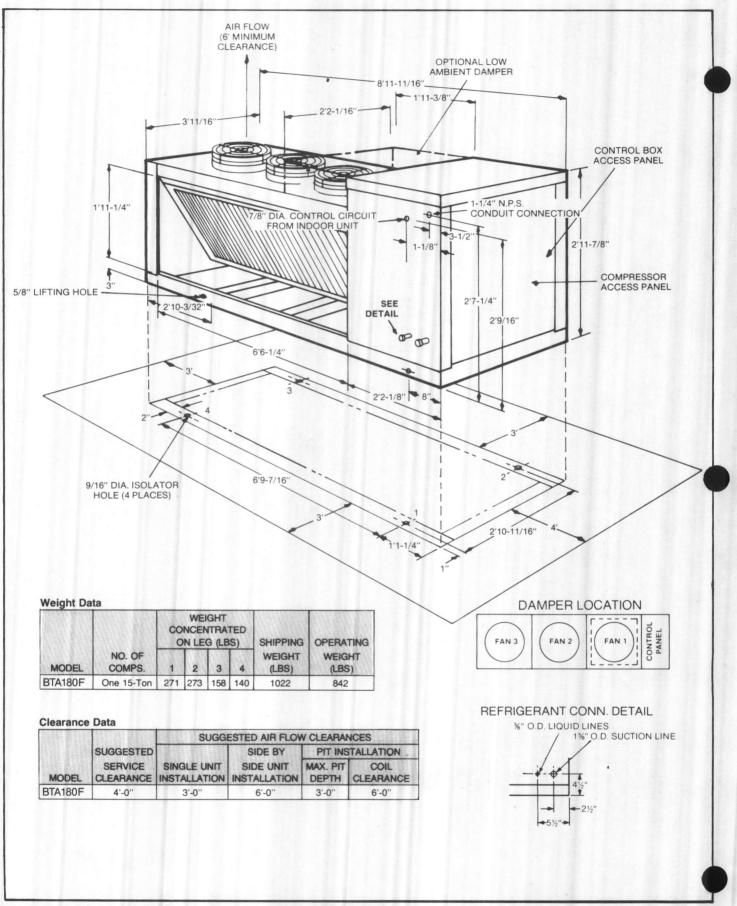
Dimensions, Weights, and Clearances for BTA180F Units
